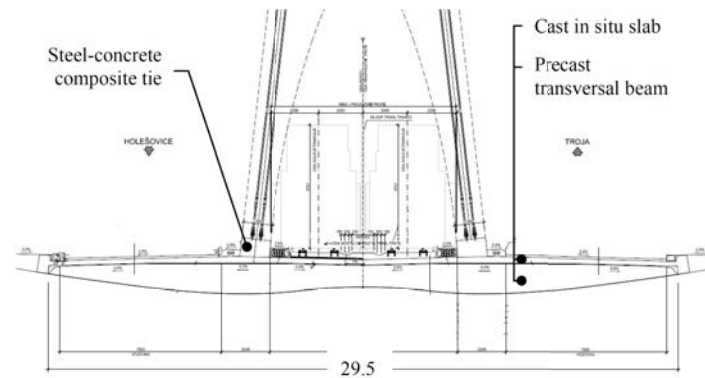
The cross section of the deck of Troja bridge as an example of wider decks in network arch bridges [42]
